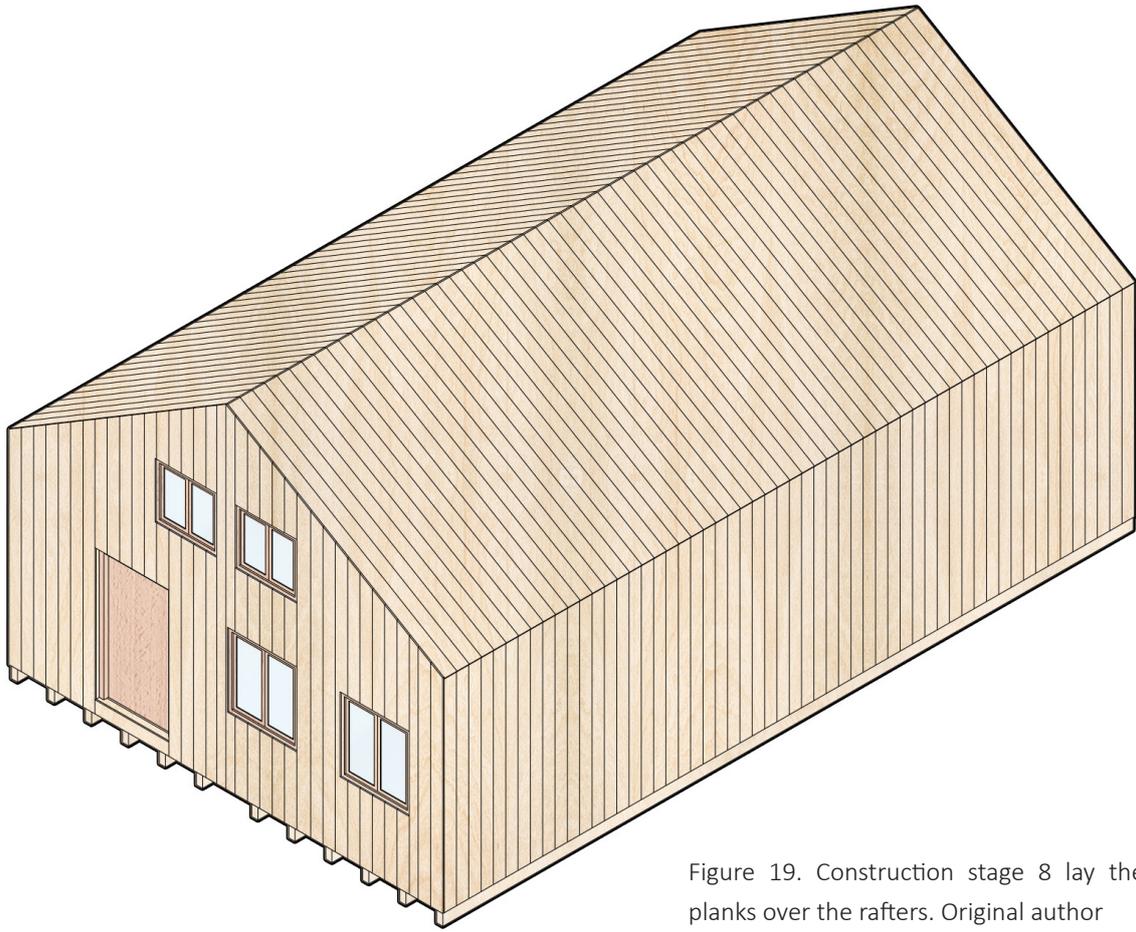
Construction stage 8 lay the planks over the rafters. Original author
